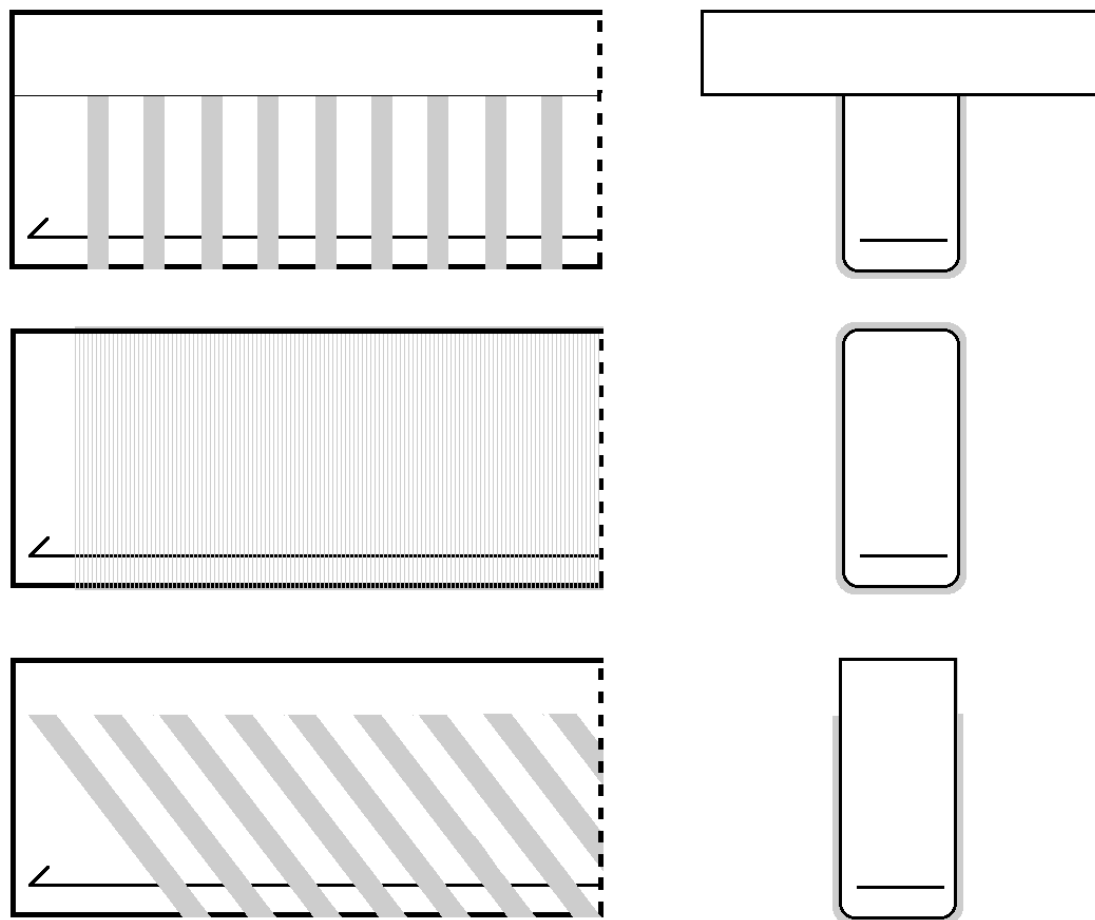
Different ways to apply FRP for shear strengthening of beams, a) fibre strips oriented perpendicularly b) fibre sheets oriented perpendicularly c) fibre strips oriented at an angle, after CRC for Construction Innovation (2005).
